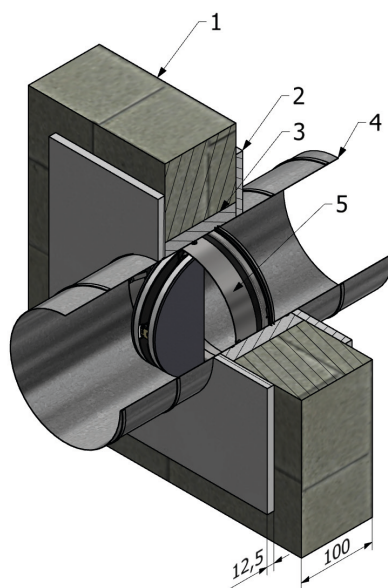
FDA-BU / FDA-BU-E, fire damper. - dimensions of plasterboard 12.5 mm.
